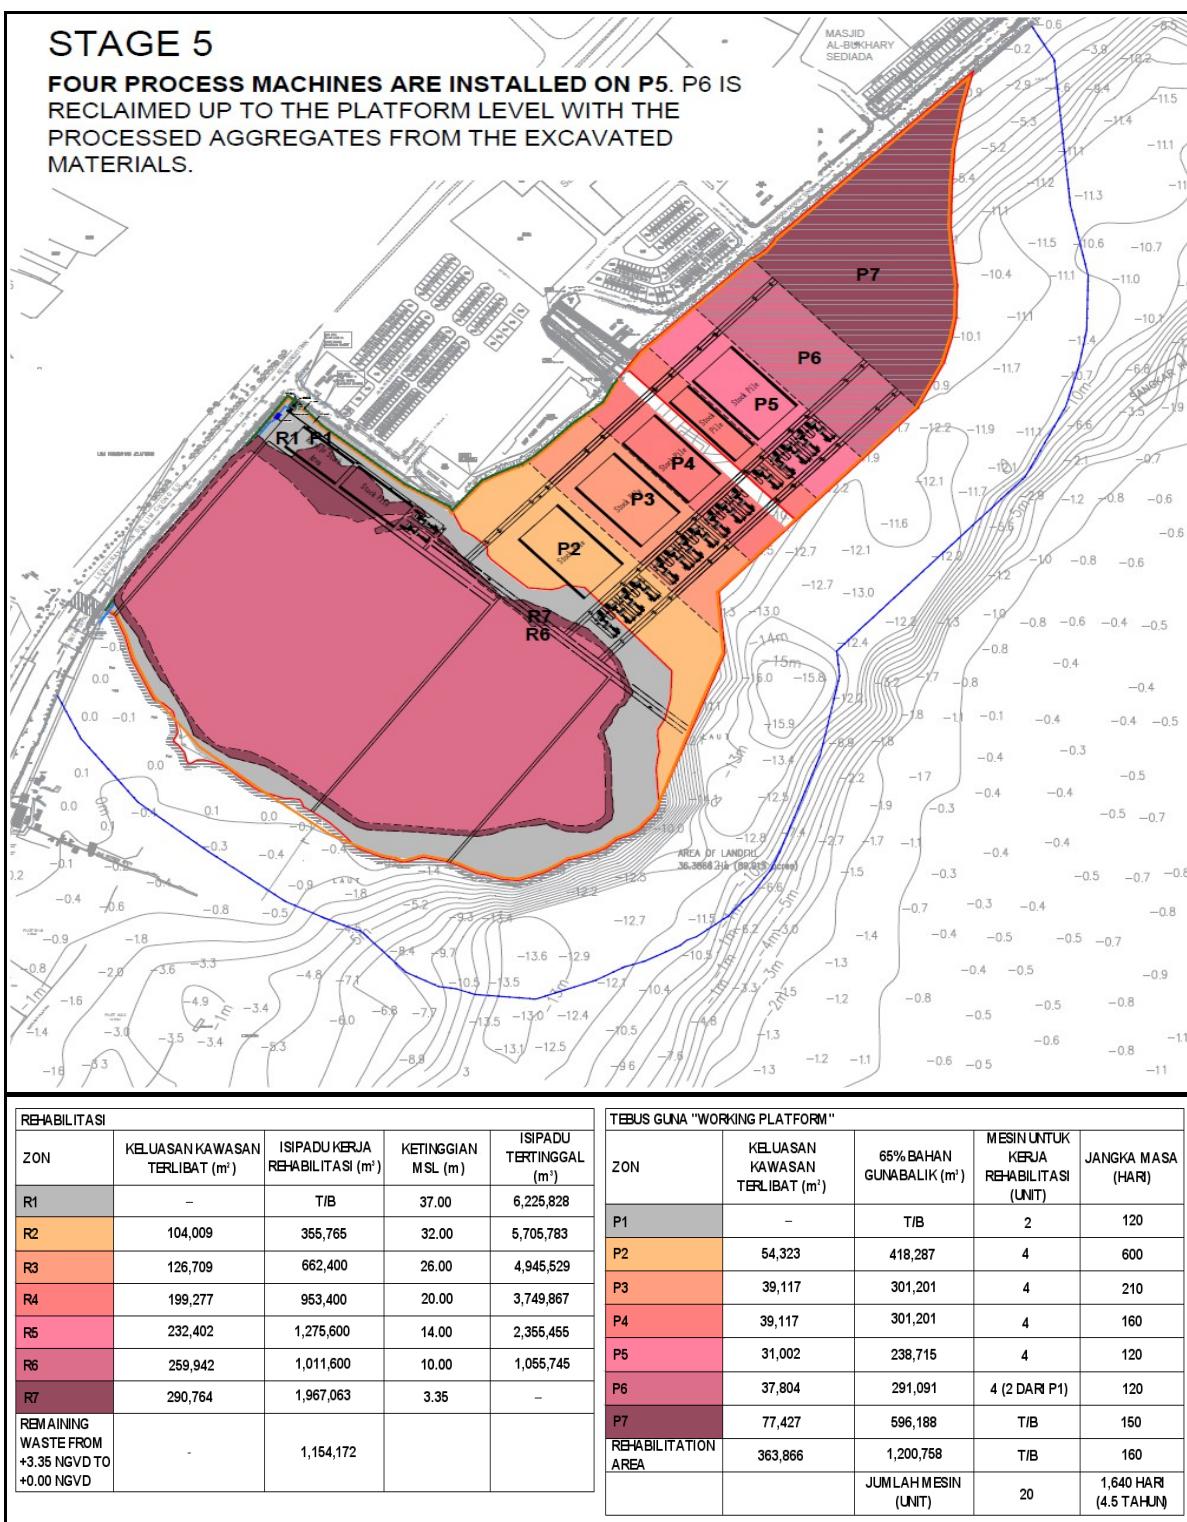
Layout Plan For Stage 5 Recycling Area On Jelutong Landfill
